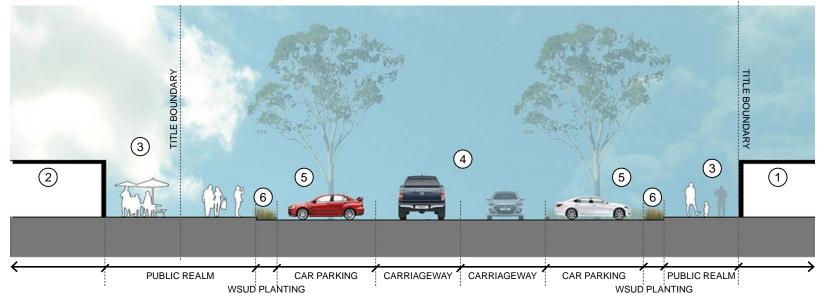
Kinglake proposed streetscape section (EE)
